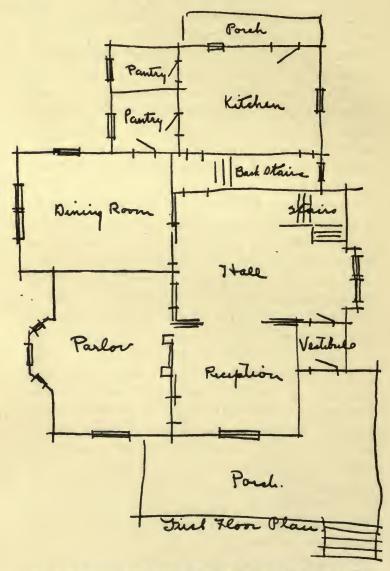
A Single-Line Sketch Submitted, from which the Architect Gets an Idea of the Arrangement.
